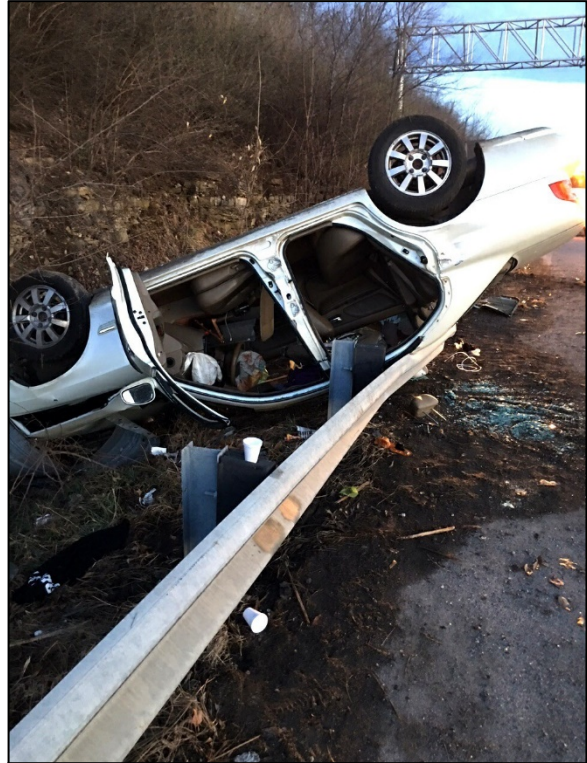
The Kia at final rest on top of the damaged guardrail, view north. Photo provided by local law enforcement agency.
